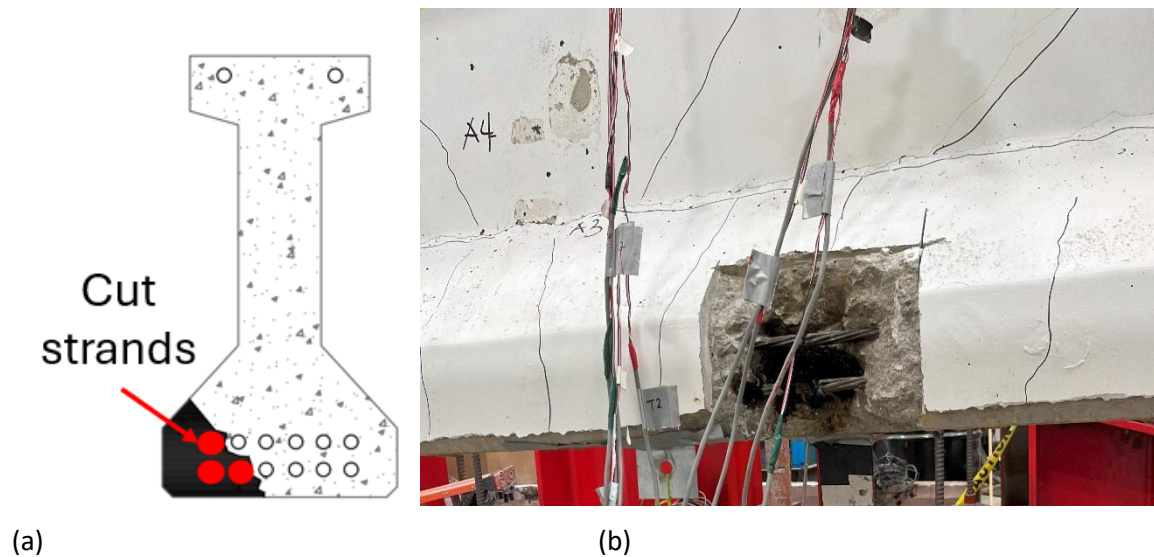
Girder G03 strands cut, (a) Cross section showing loss of strands, (b) The section along the girder where strands were cut (before the flexural test)
